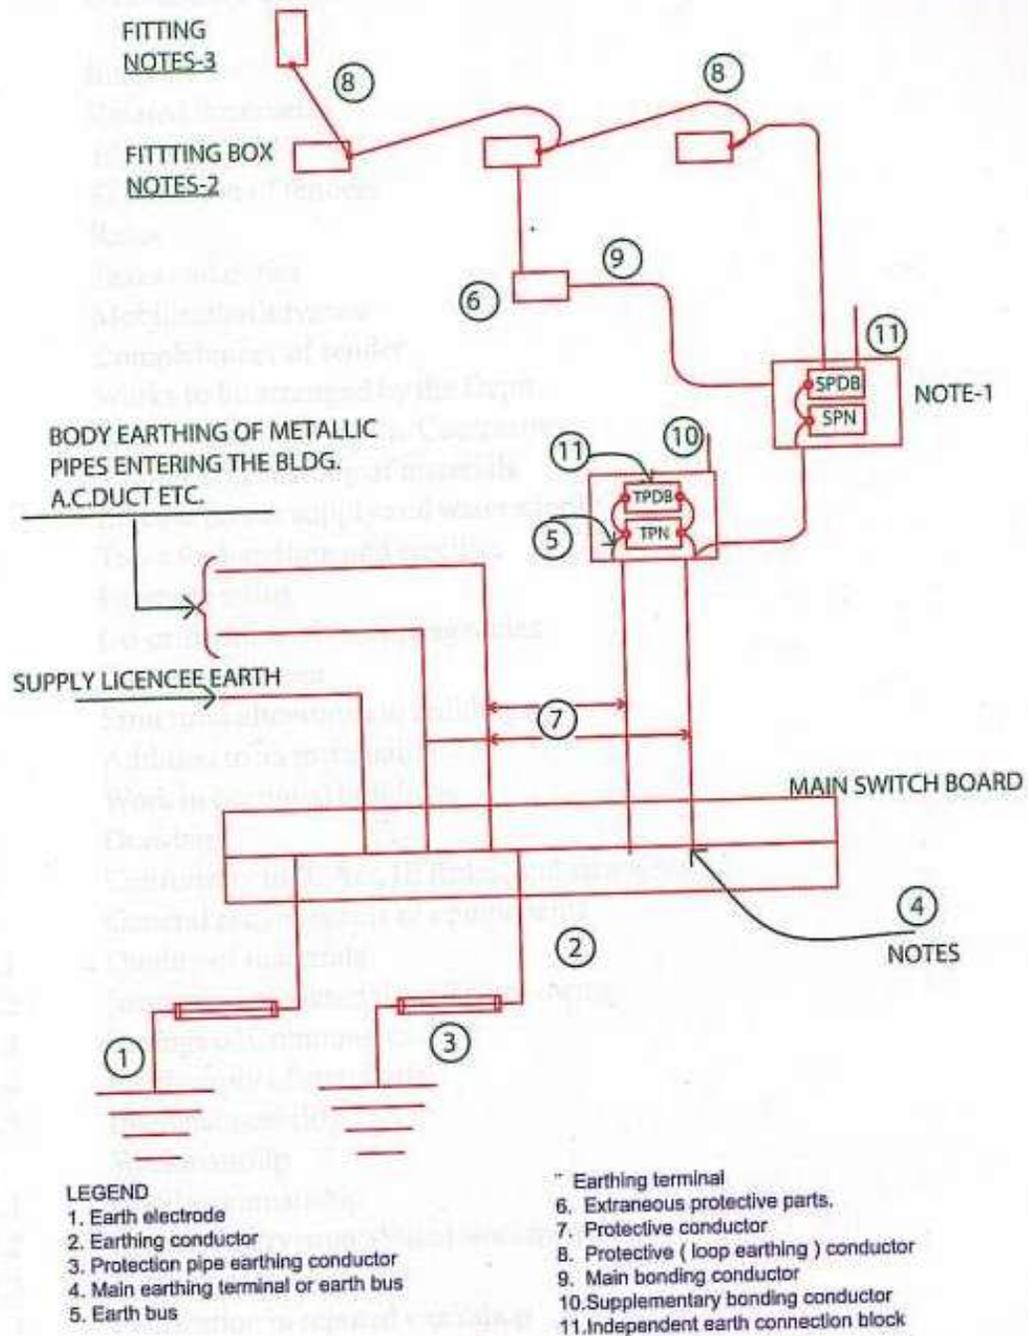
Typical Earthing Schematic for Internal Electrical Installation
